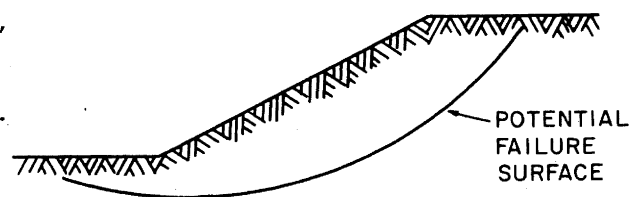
SLOPE WITH POTENTIAL FAILURE SURFACE
